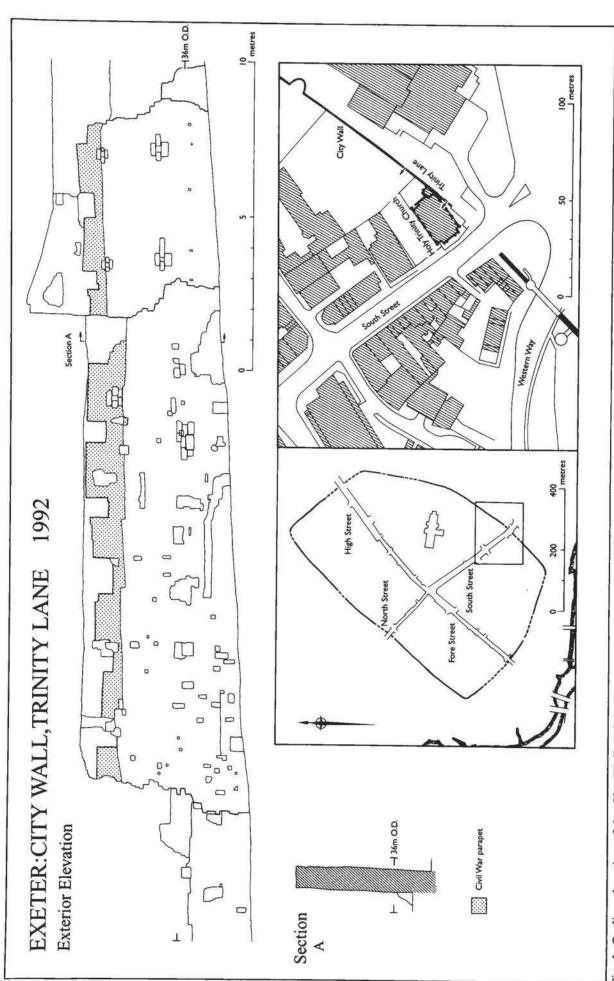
Outline elevation of the City Wall, Trinity Lane.
